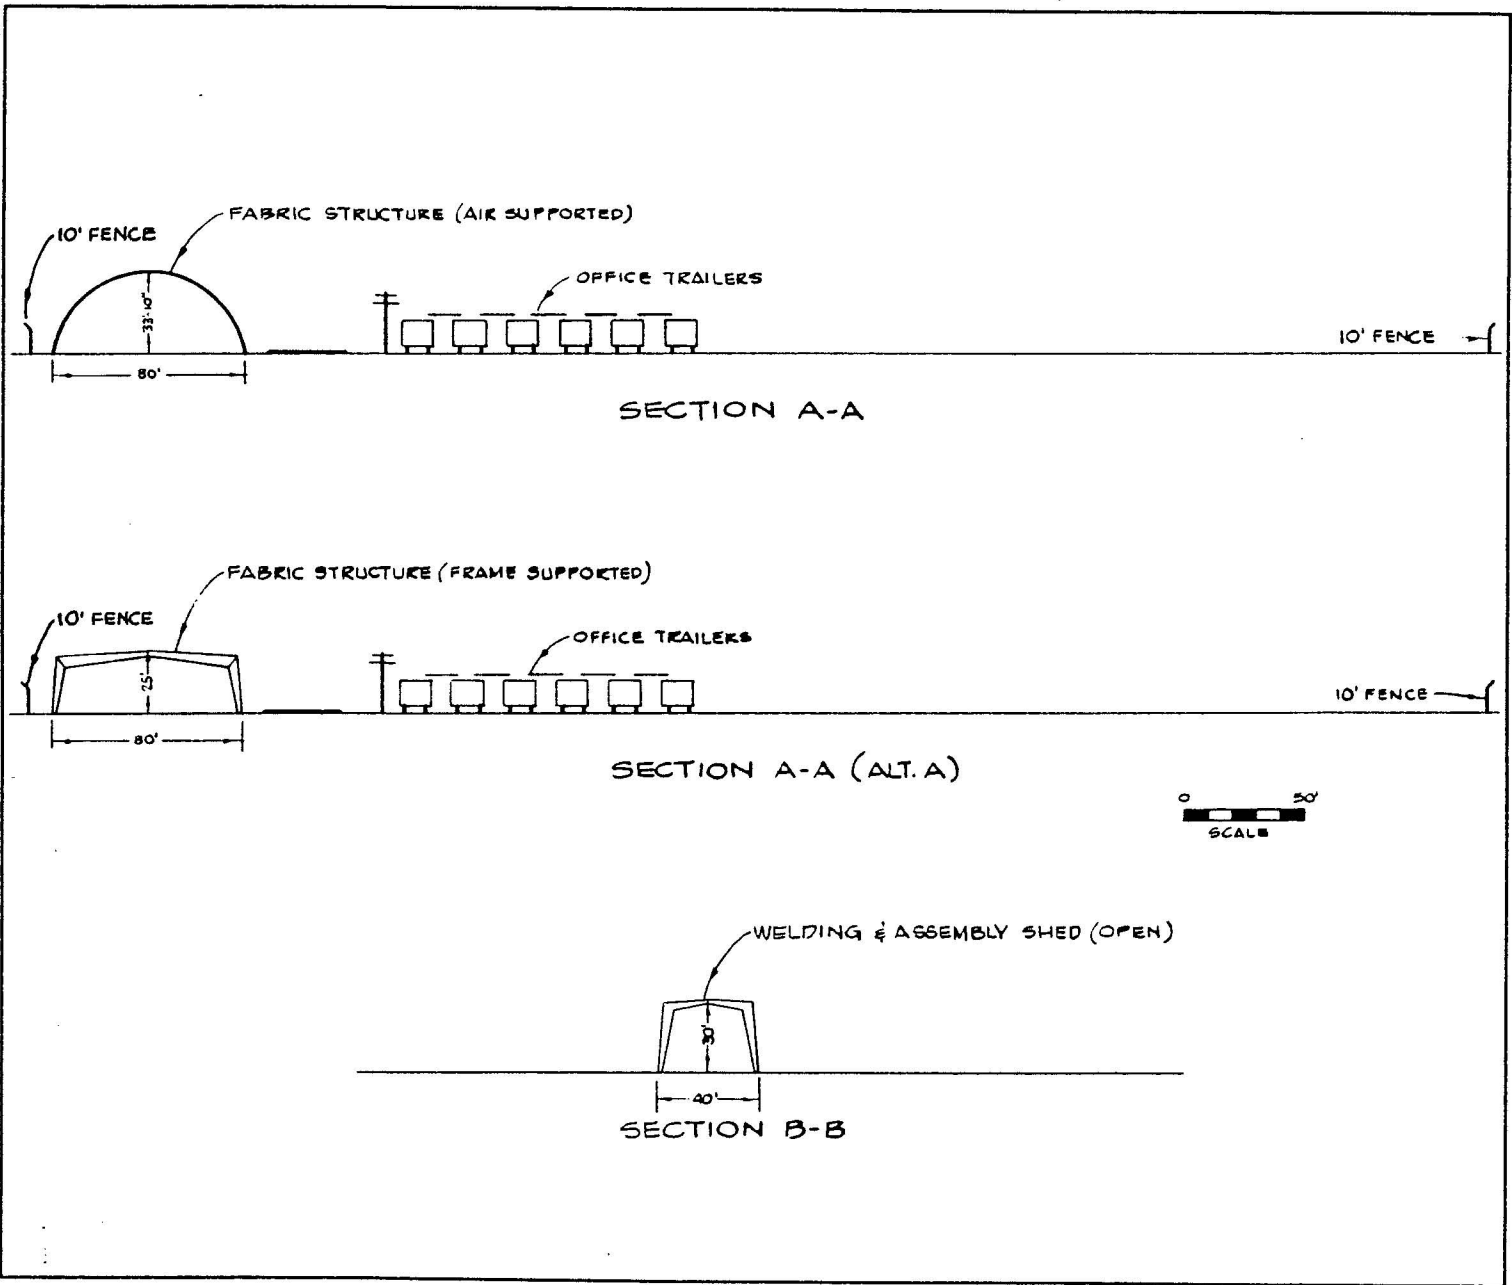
Preliminary Elevation Drawings of the Temporary Structures
